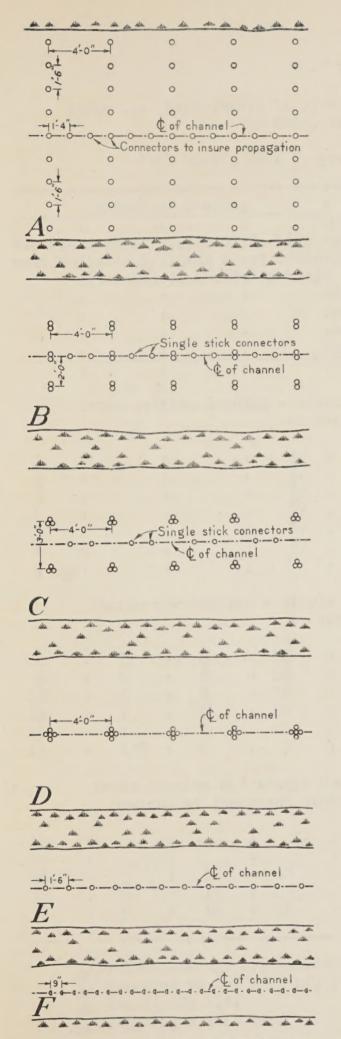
Loading plans used in ditch cleaning experiments in Ohio
